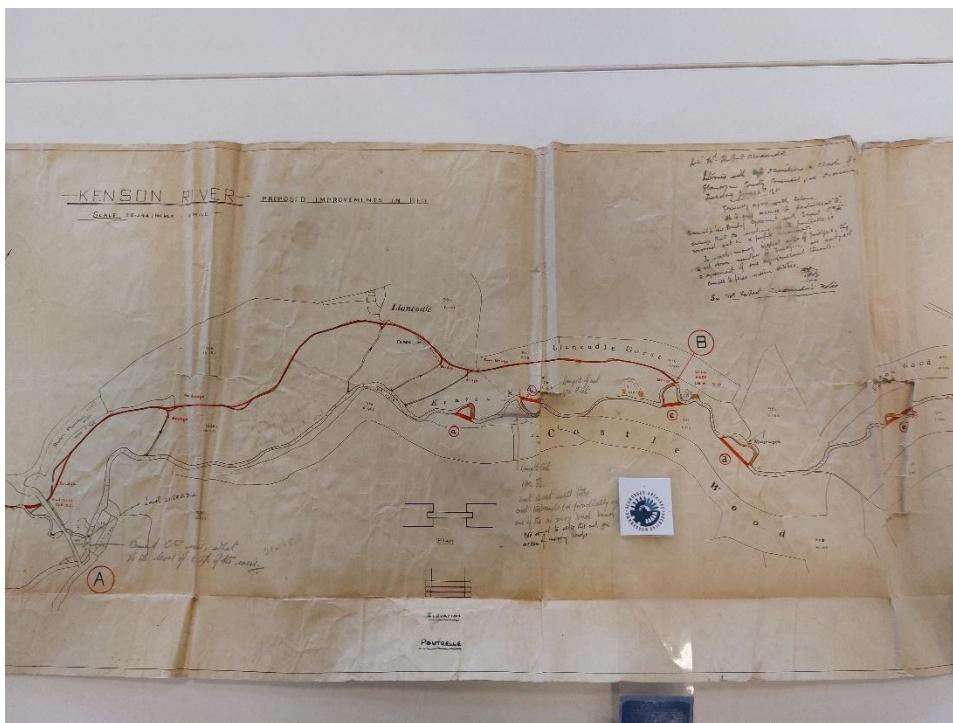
Plan of the "Proposed Improvements" to the Kenson River dated to 1931, as provided by Glamorgan Archives.
